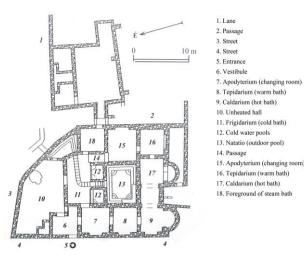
Layout drawing of the double bath (Aquincumi Múzeum)
